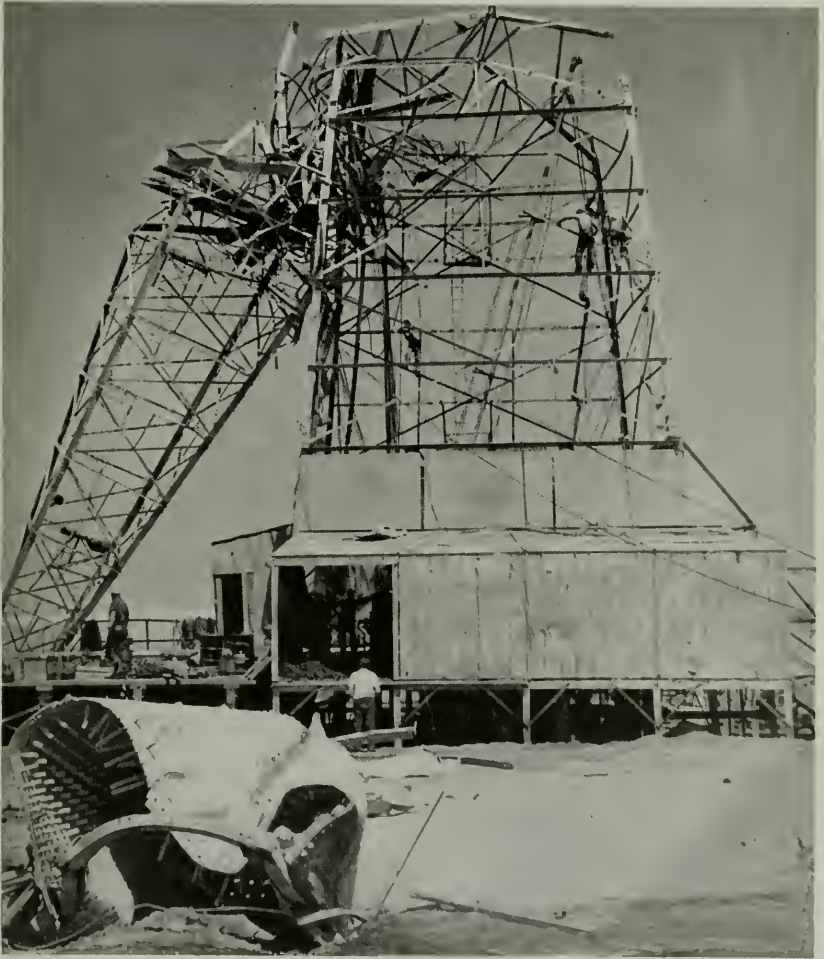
Derrick in an oil field wrecked by an explosion of an oil-well drilling boiler which was located a quarter of a mile away. The boiler's fire box that crashed into the derrick is shown in the foreground.
